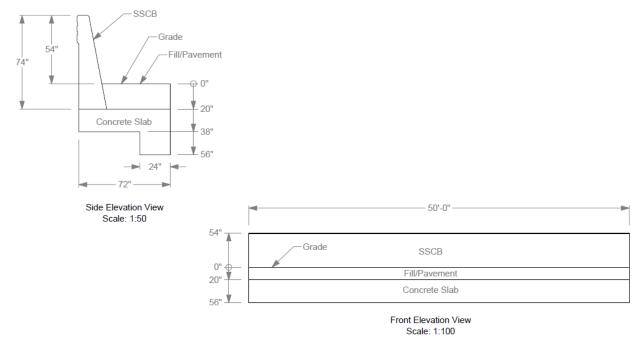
Concept 7 – Moment Slab with Concrete Beam and Overlay Design.
